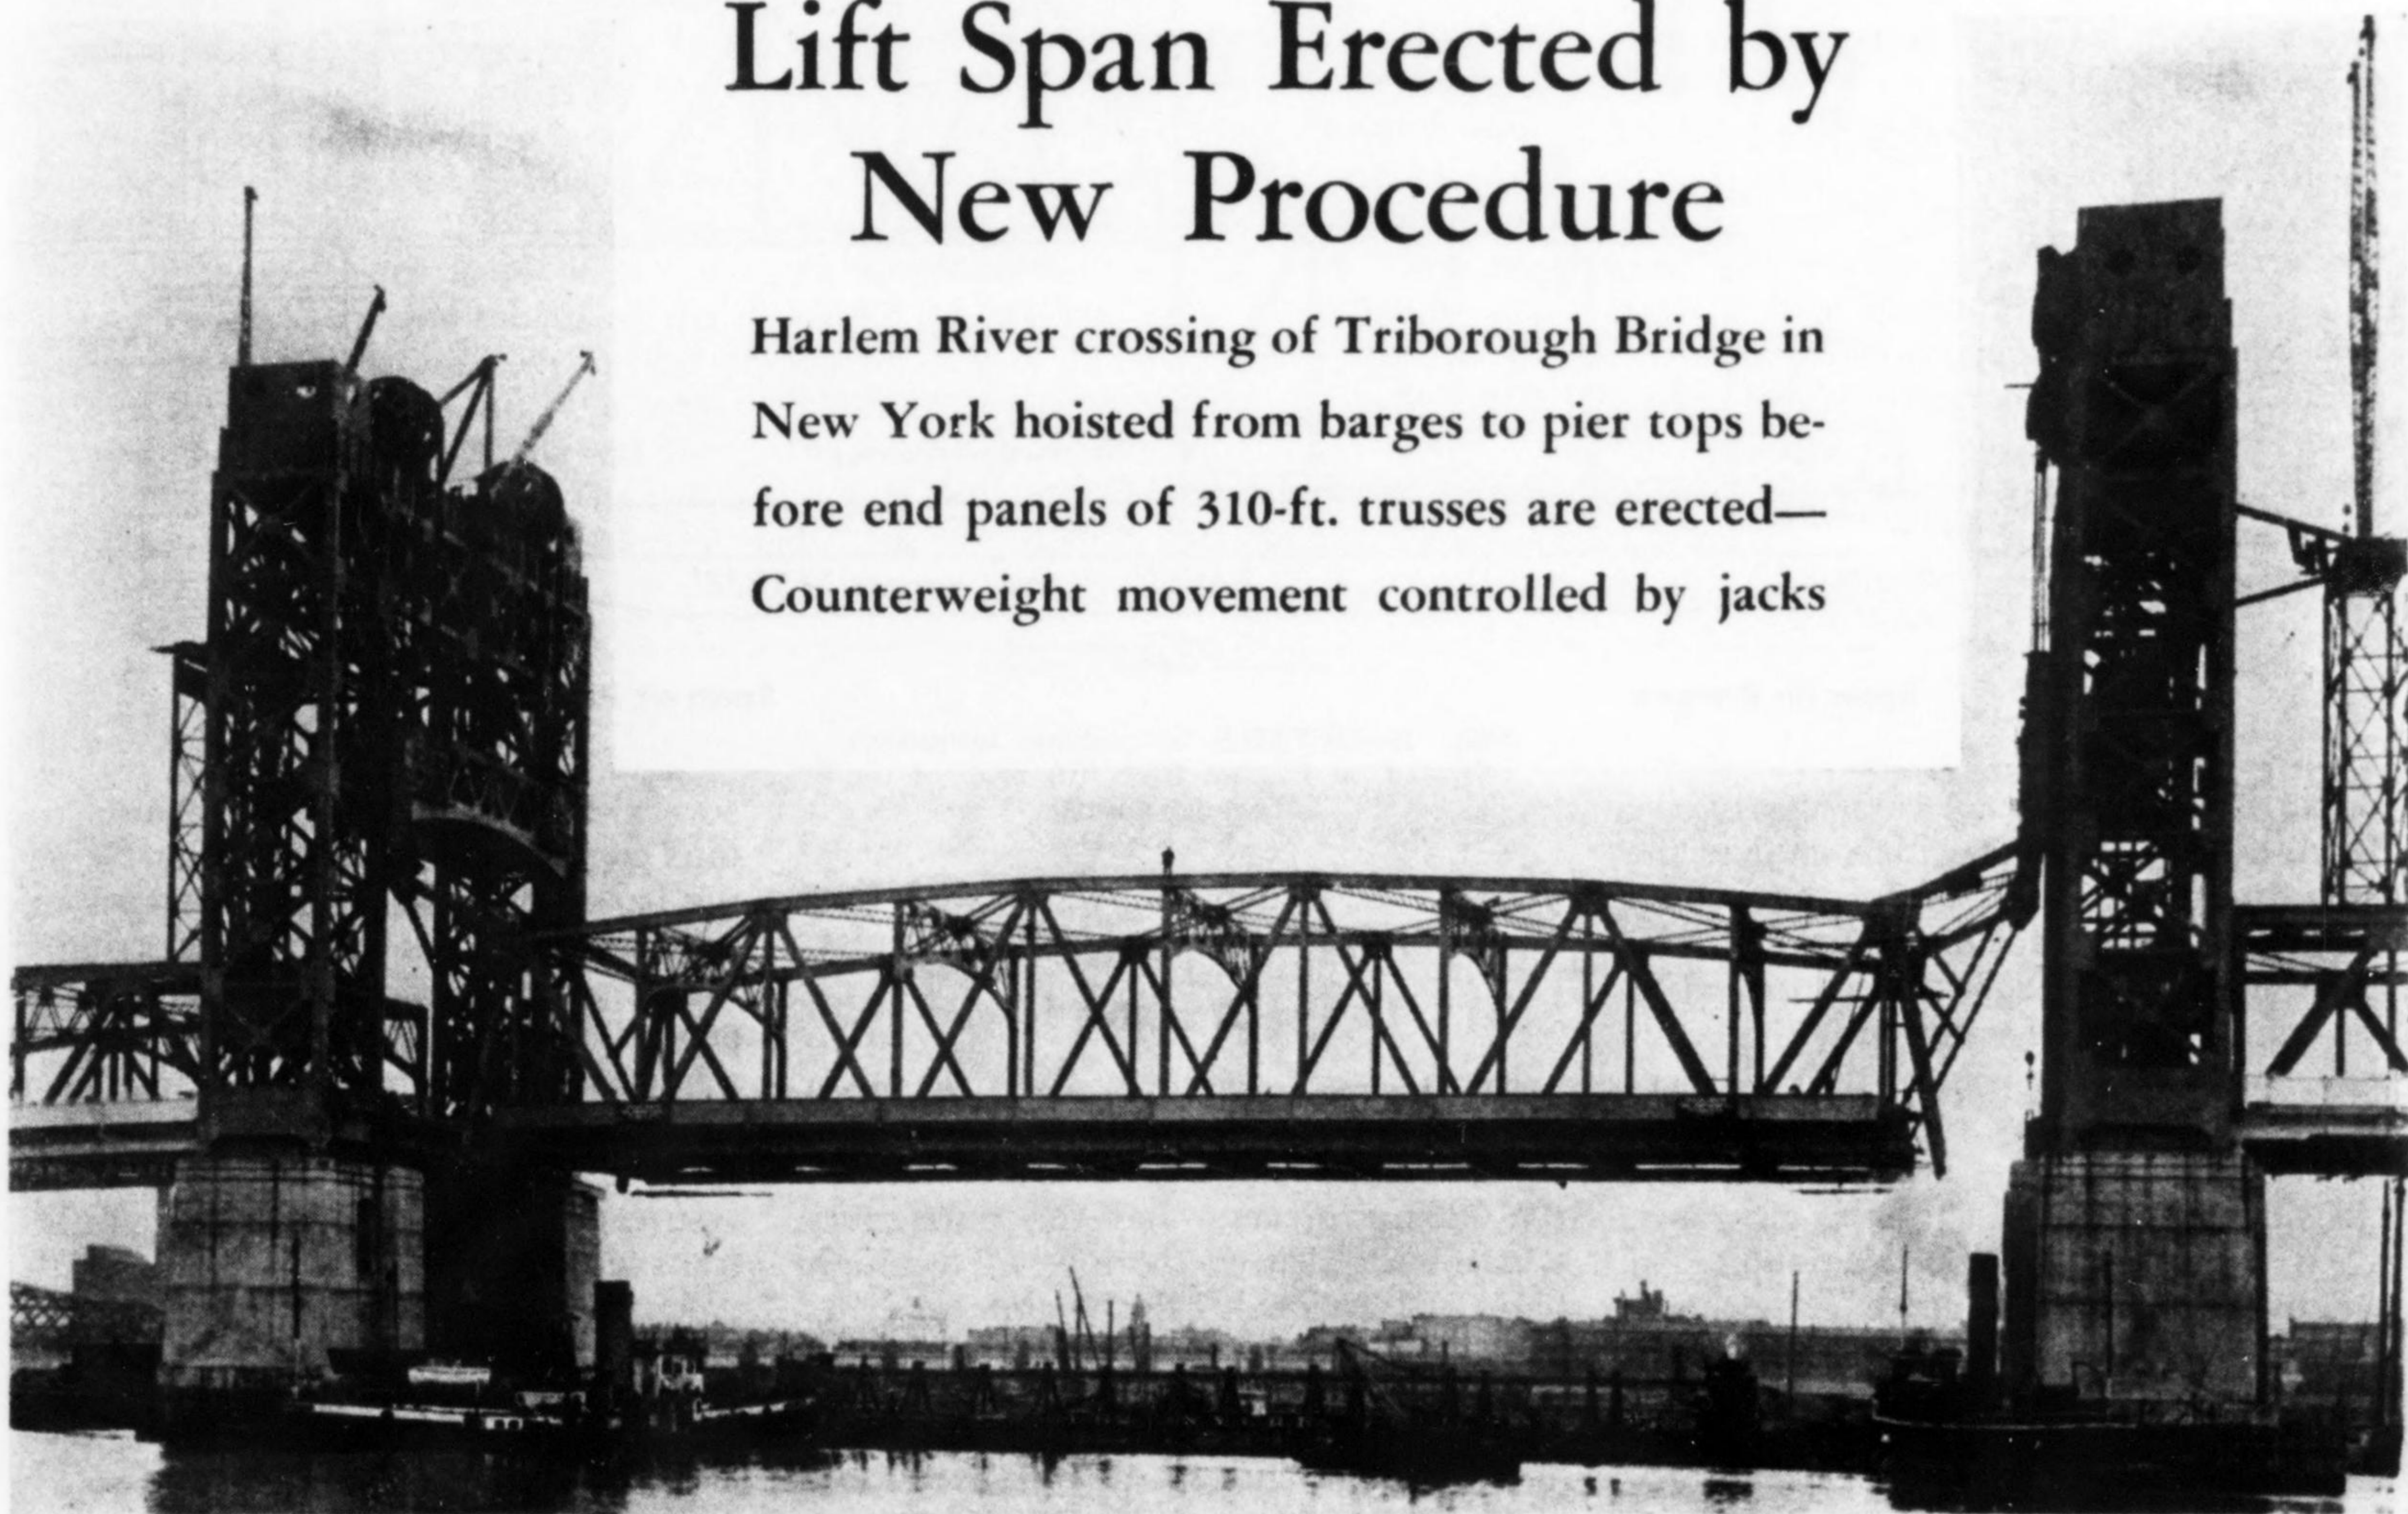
RAISING the Triborough lift span by temporary outrigger connections to the lifting girders. The end panels of the trusses, missing in this picture, were erected as the next operation, to permit the span to be landed on the pier shoes.
